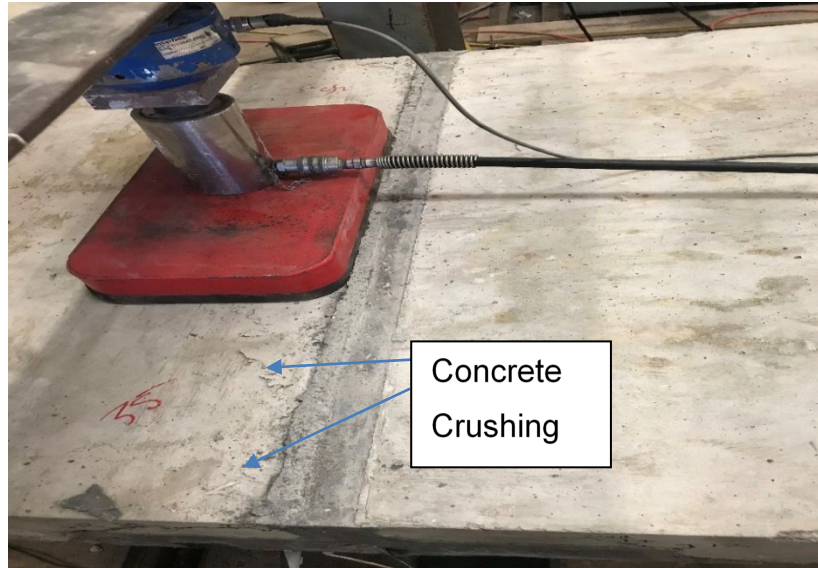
Concrete crushing at the top of Ductal® slab 1 indicating failure
